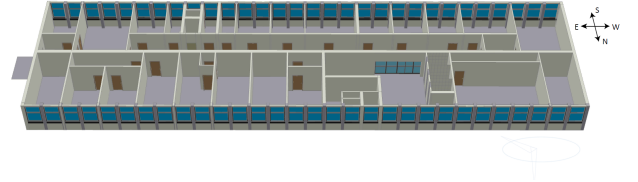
3D drawing of the 9th floor of FER skyscraper building.
